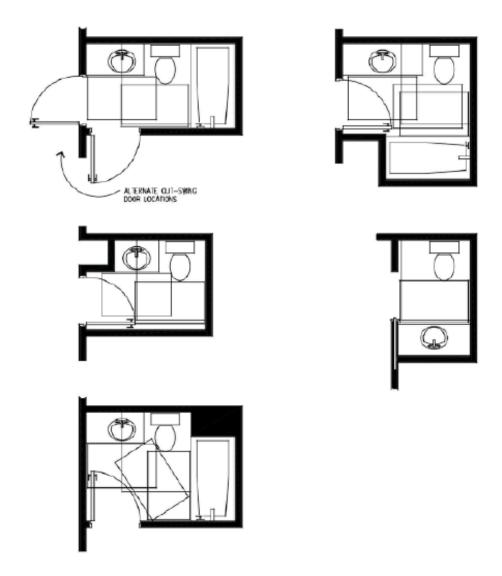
EXAMPLES OF BATHROOMS WITH FLOOR AREA TO SUITE "MINIMALLY ACCESSABLE" REQUIREMENTS
